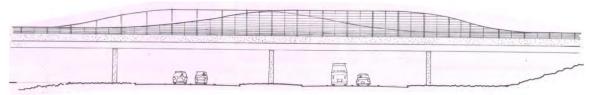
Proposed Option 1 Elevation View (Source: Dorton Design)
